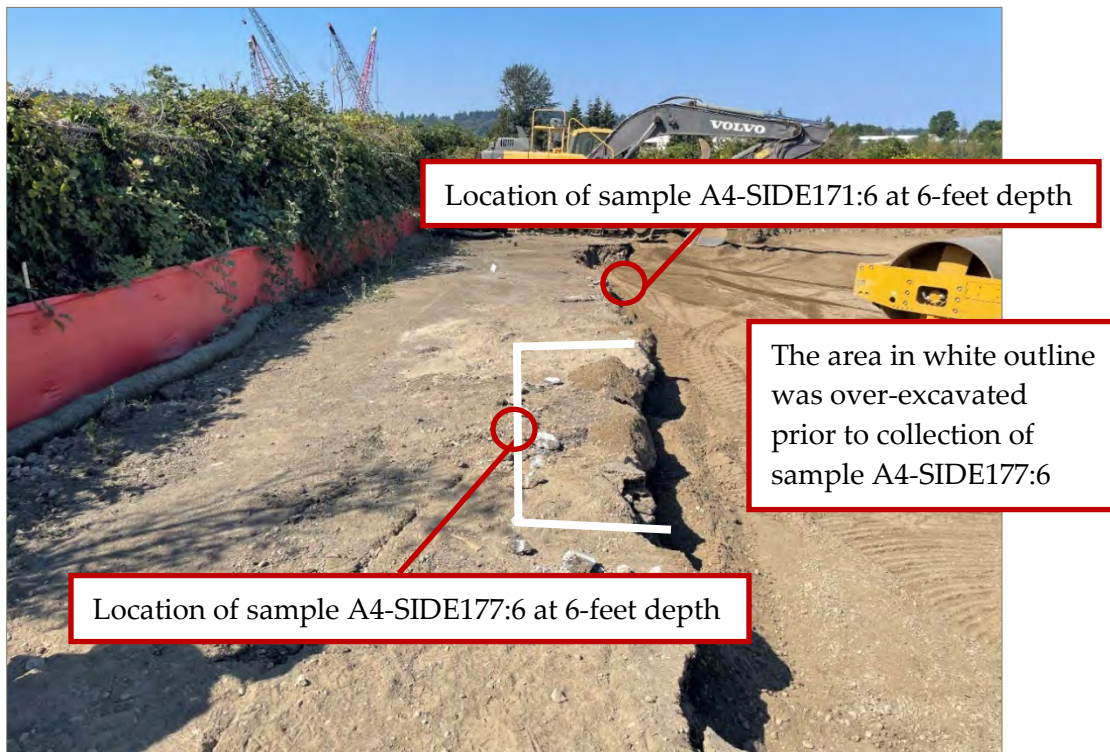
View of Proximity to Shoreline Berm Downslope to Samples A4-SIDE171:6 and A4-SIDE177:6. View direction is west. Photo taken on August 31, 2022.
